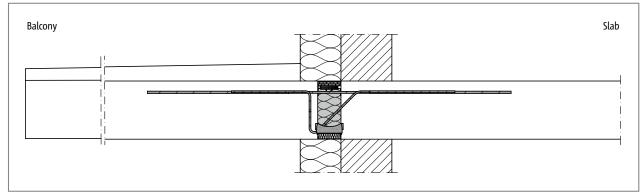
Schöck Isokorb® T type K for REI120: Balcony connection REI120
